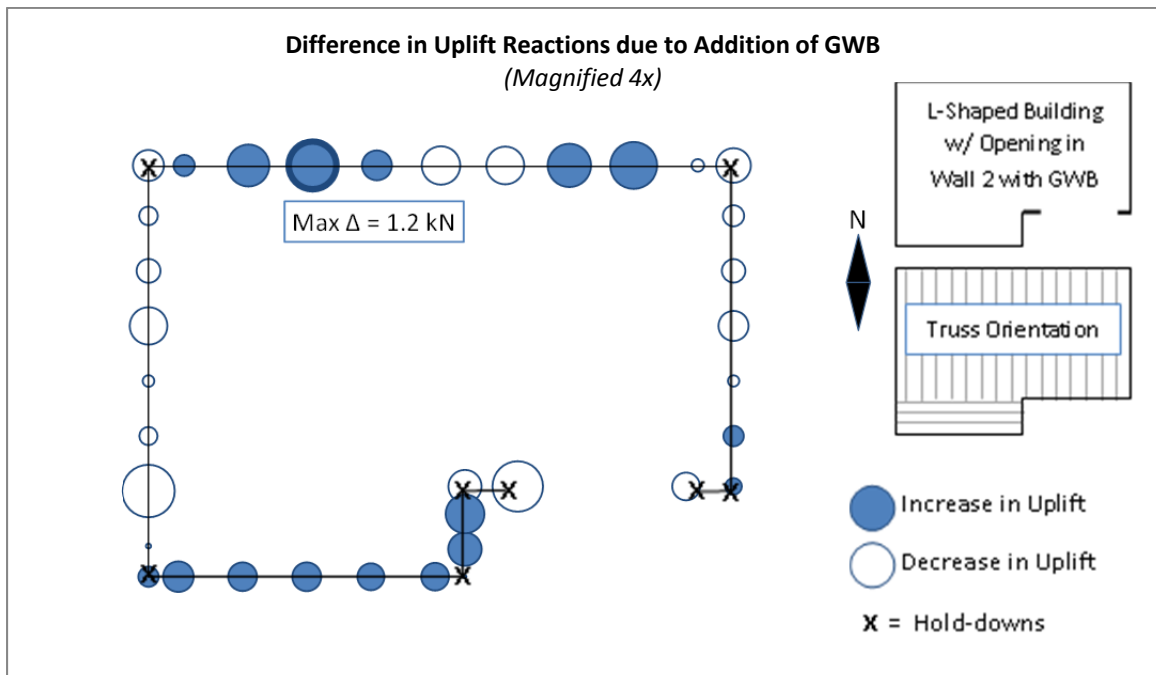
Difference in Uplift Reactions in L-Shaped Building with Opening in Wall 2 Due to Addition of GWB
